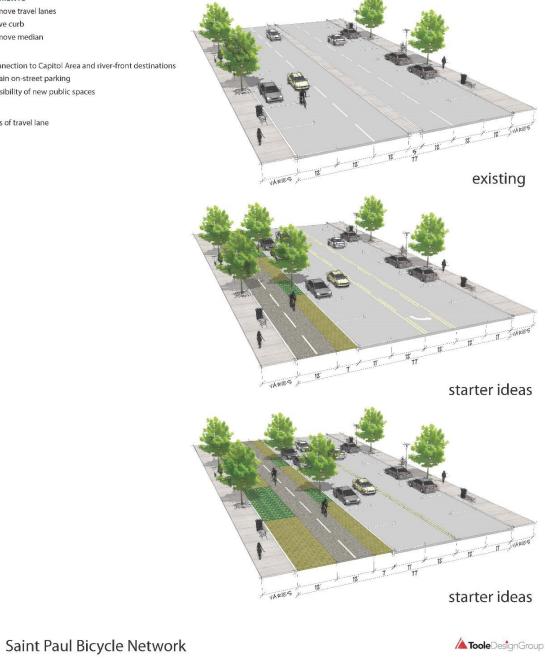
Jackson Street Segment 1 Starter Cross-sections
